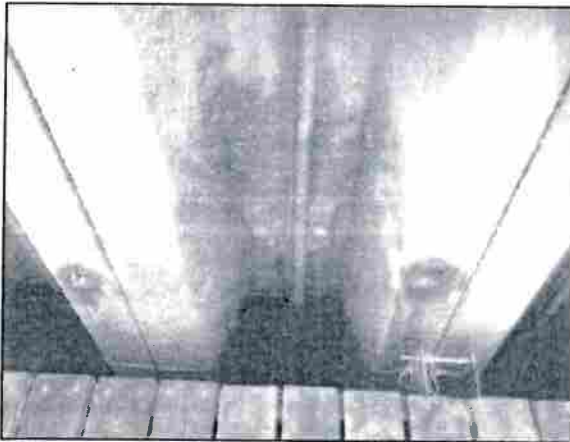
Burned holes in the steel sheet pile to relieve the hydrostatic pressure behind the wall.
